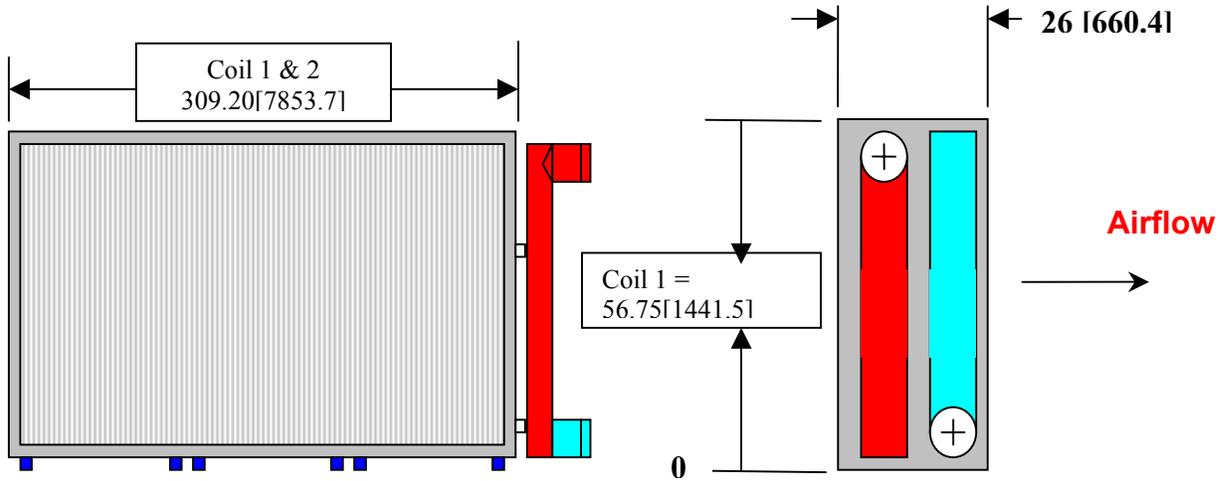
Maximum Chiller Coil Dimensions and Supplied Equipment.
